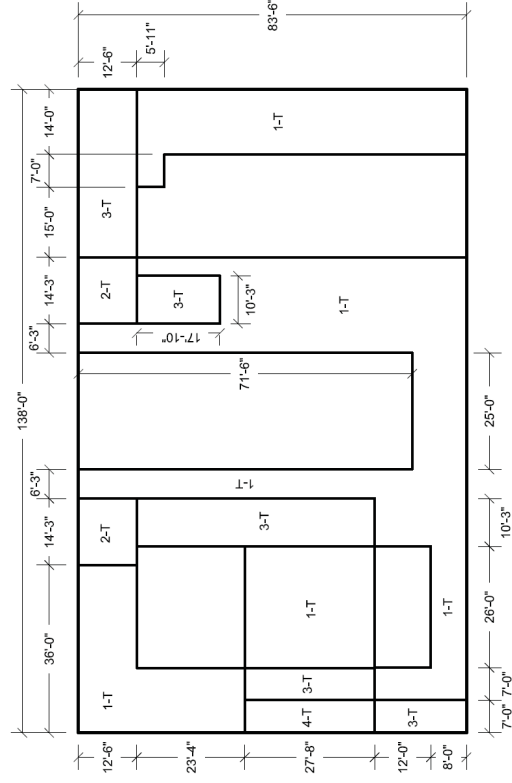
H.6-101: UHS BASIN WEST WALL LOOKING EAST
